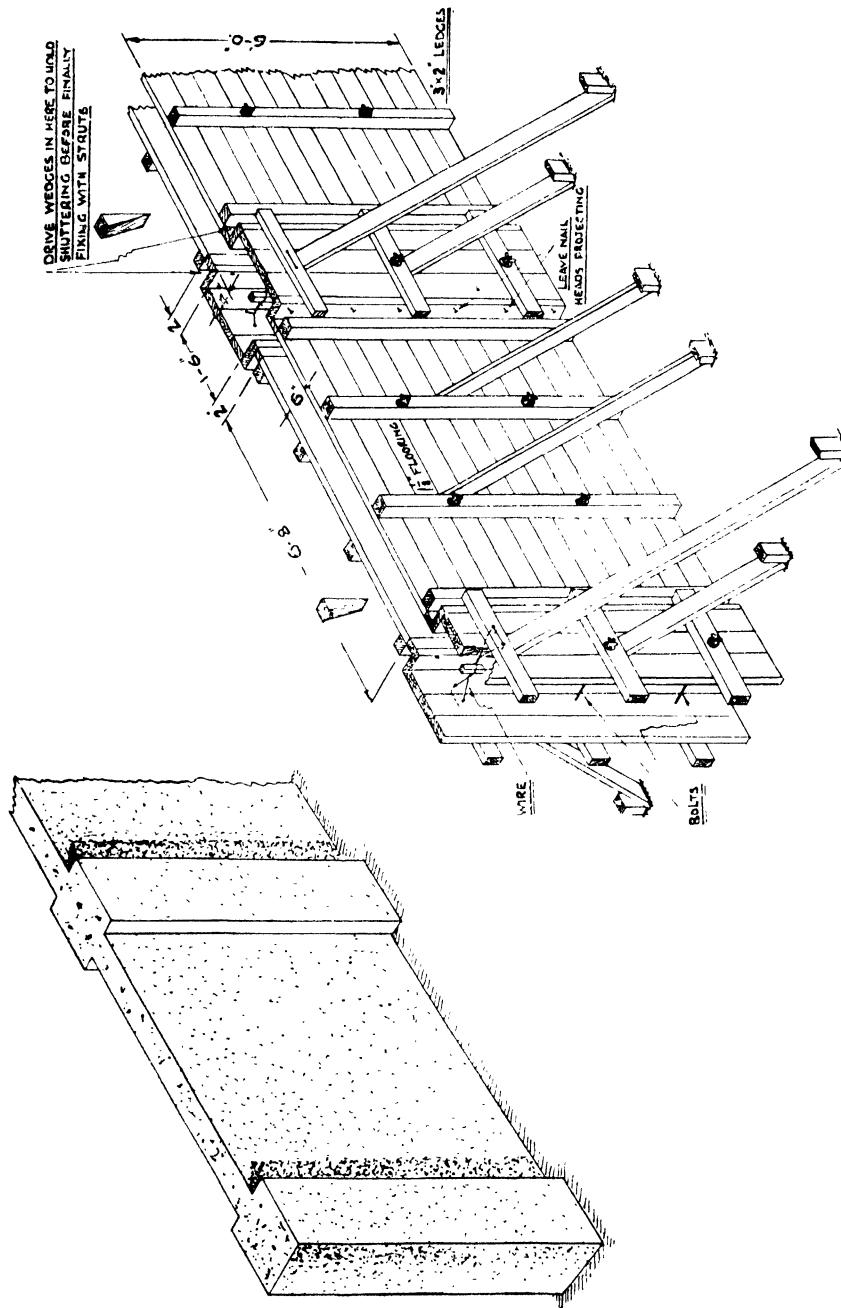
METHOD OF ERECTING SOLID CONCRETE WALL ON PIER AND PANEL SYSTEM
